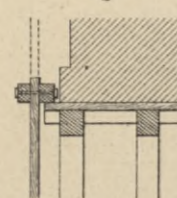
A cross-sectional diagram showing another method of attaching a sheet pile wall.
